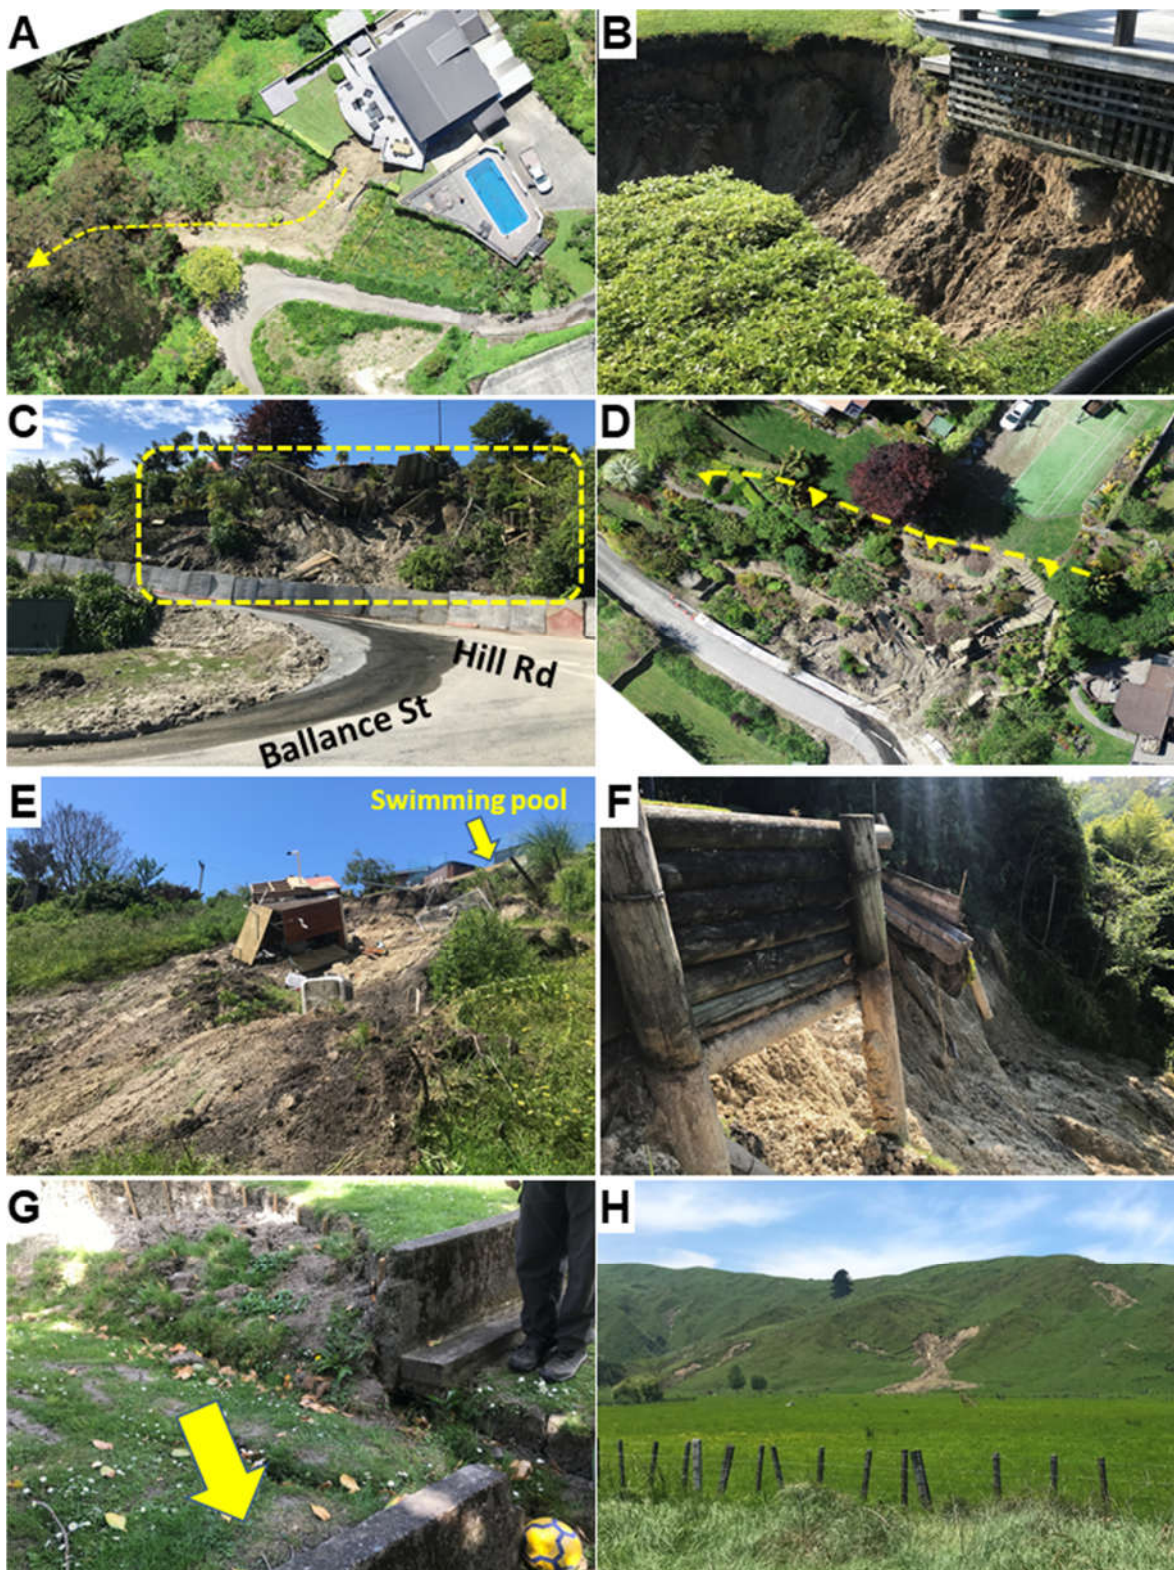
(A, B) Slump-flow at Clifford Street affecting deck and swimming pool; (C, D) Ballance Street fill/retaining wall failure; (E) Gaddum's Hill Road earthflow downslope towards 17 Darwin Road; (F) retaining wall failure at Owen Road; (G) scarplet and offset retaining wall, Argyll Street; (H) shallow earthflows at Wheatstone Road.
